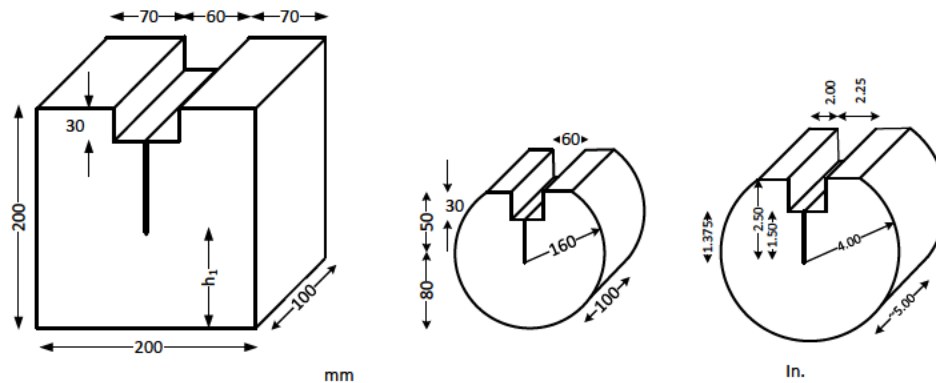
Dimensions of the specimens for the wedge splitting test (all dimensions in mm)
